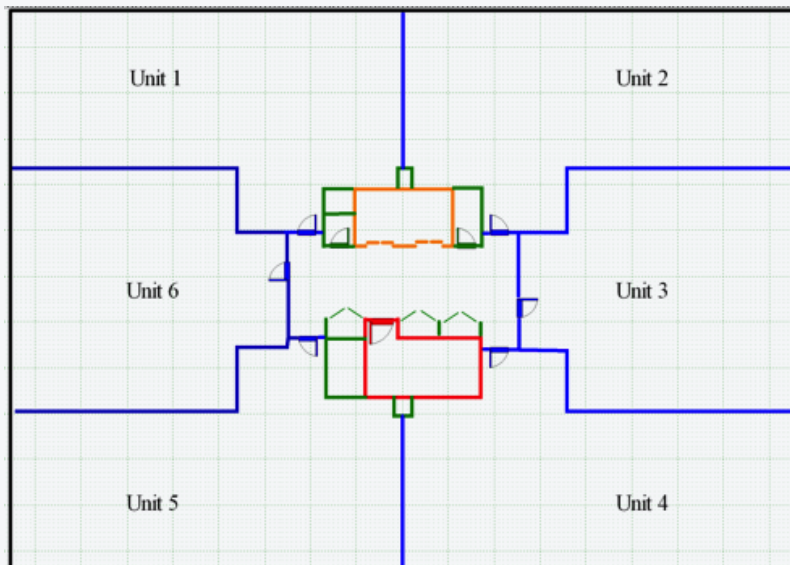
Horizontal section through typical upper floor of generic Class 2/3 or 5 building.
